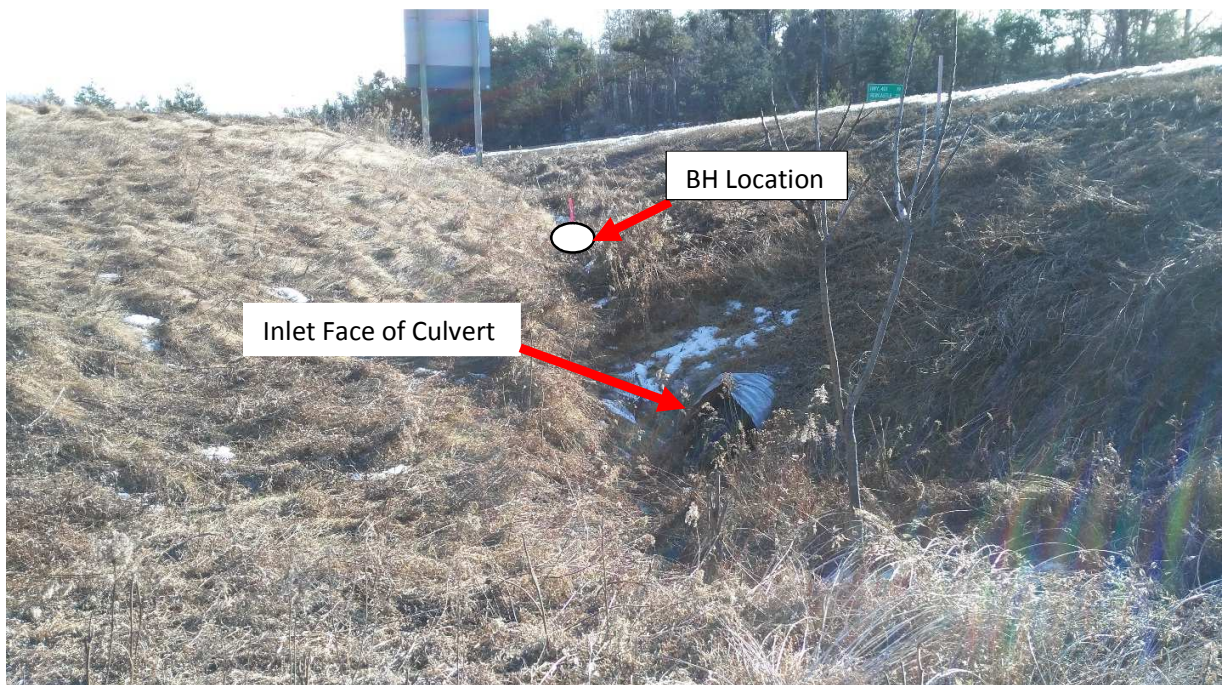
Facing southwest, Eastside of culvert (BH16-1-3 Location)
